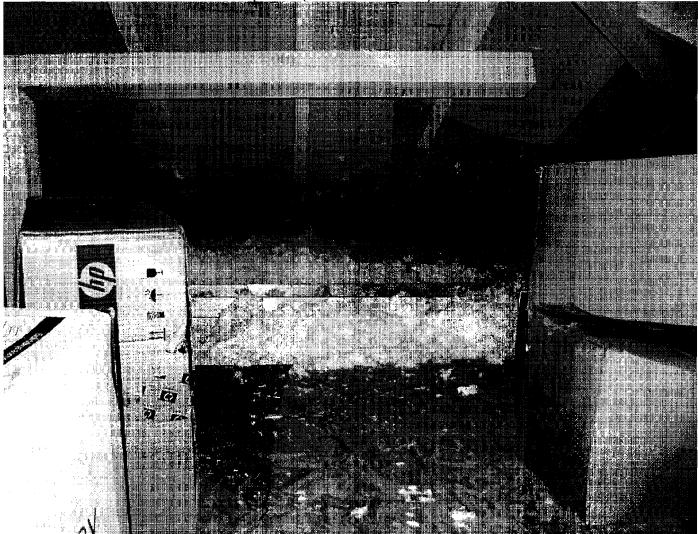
View of the attic space. Insulation around the edge of the plywood flooring was moved aside in several locations but no markings of any kind were visible on the drywall. Note that the wood that forms the roof has been sealed with primer (from the 2004 fire).
